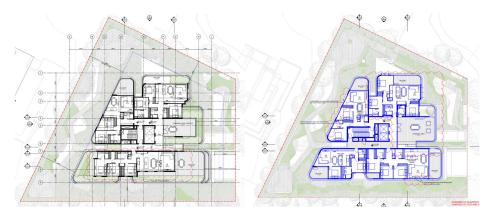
Level 8 plan previously approved (left) and level 10 plan proposed (right)
